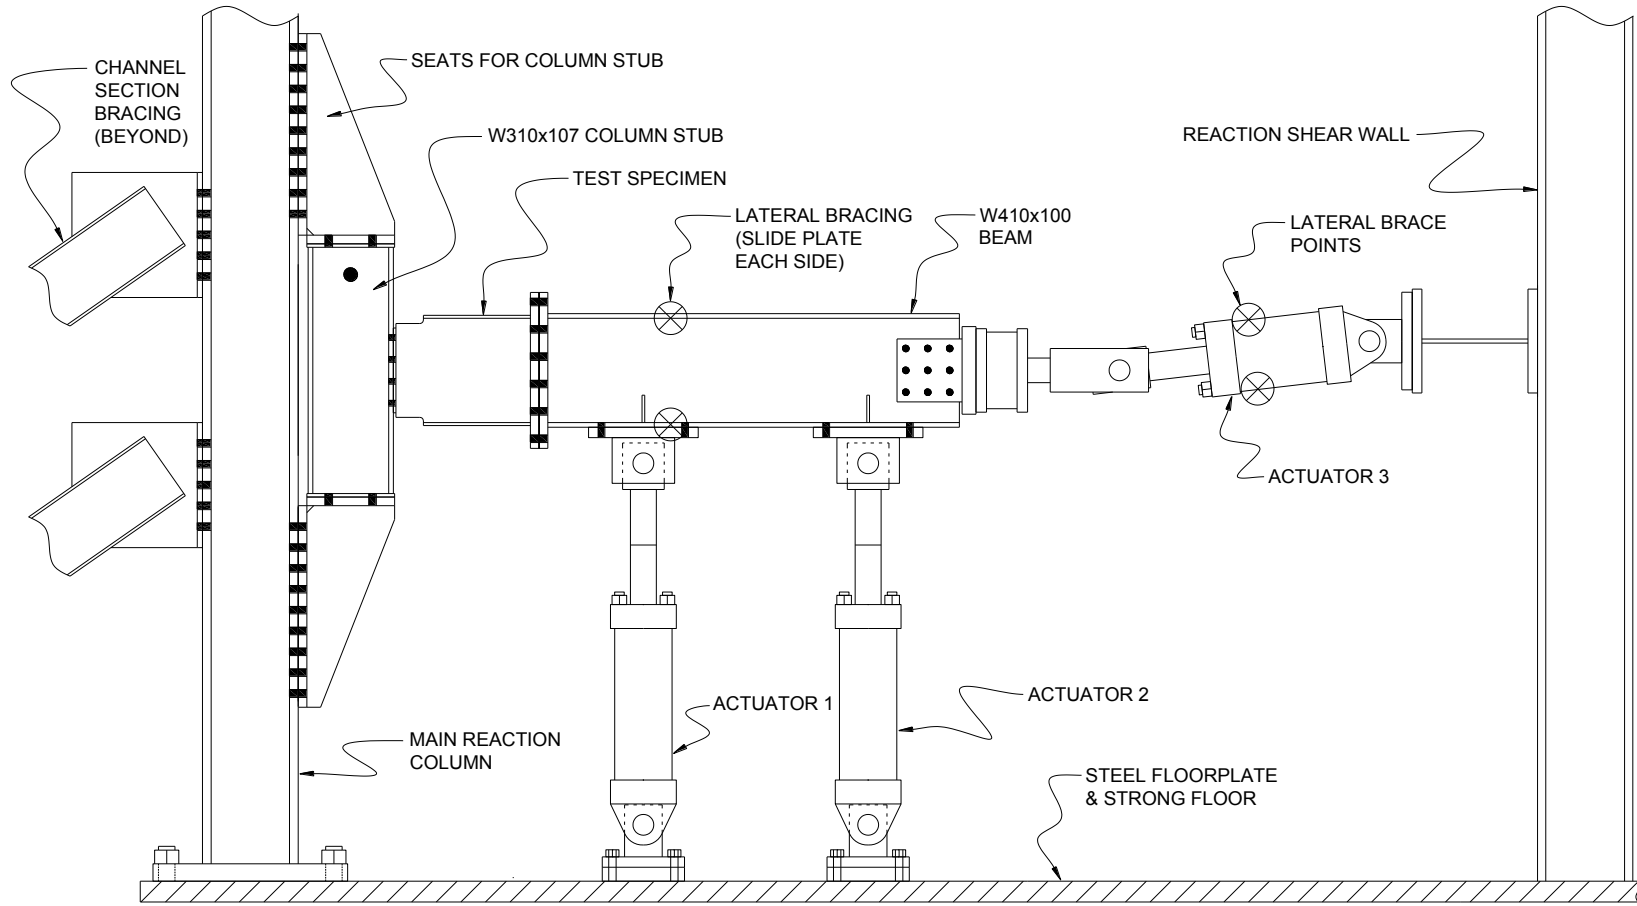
Test set-up for end-support B in elevation (C similar)
